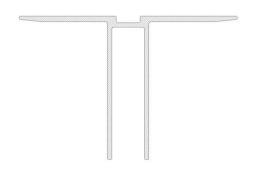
Detail drawing of the façade system's bracket [drawing created using AutoCAD]
